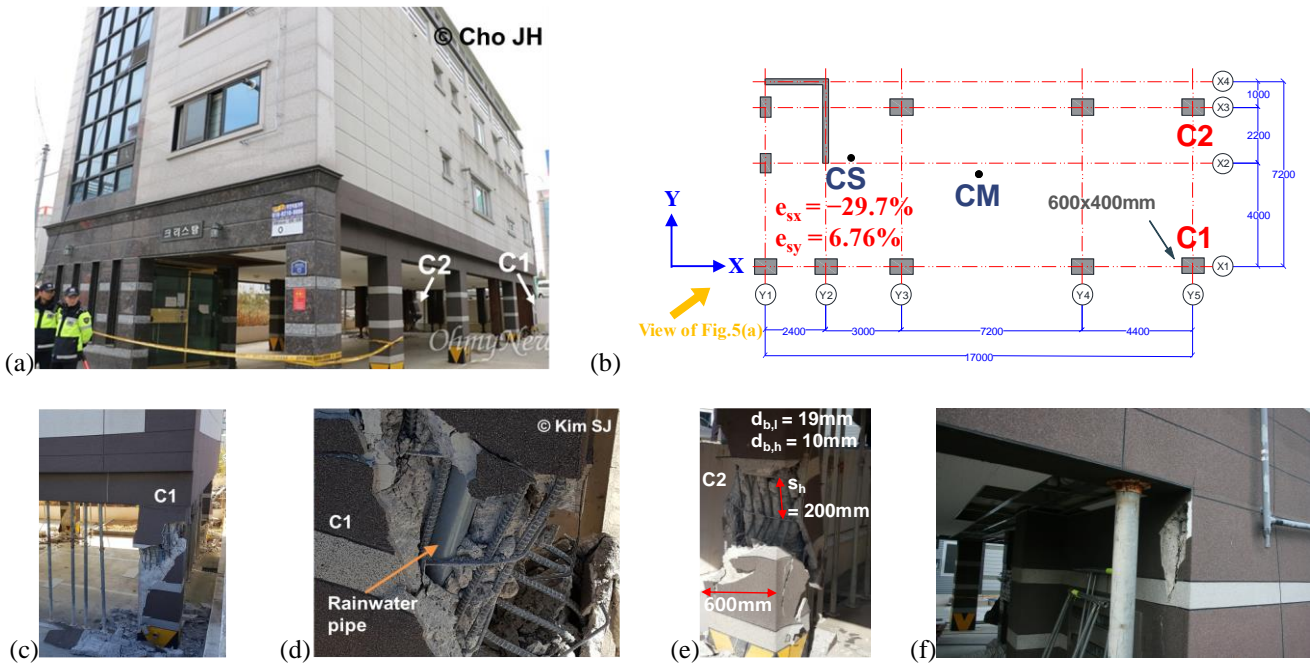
Target structure (Building C) in Figure 1(c): (a) Building C, (b) 1st floor plan, (c)-(e) damaged columns, (f) damaged shear wall. [13]
